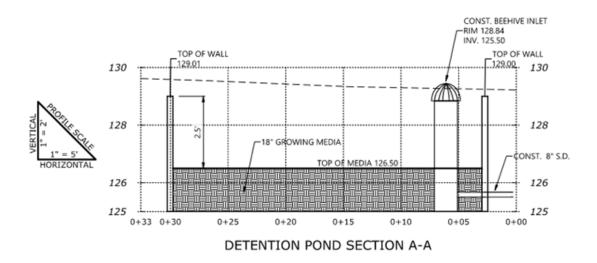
above shows a cross section of the pond with surrounding walls and a 24" beehive inlet set at 2 inches below the top of wall. The rim is set just above the peak water elevation of the 100-year rainfall event. The outfall which serves as an overflow device runs southeast to the existing storm drain manhole and French drain.
